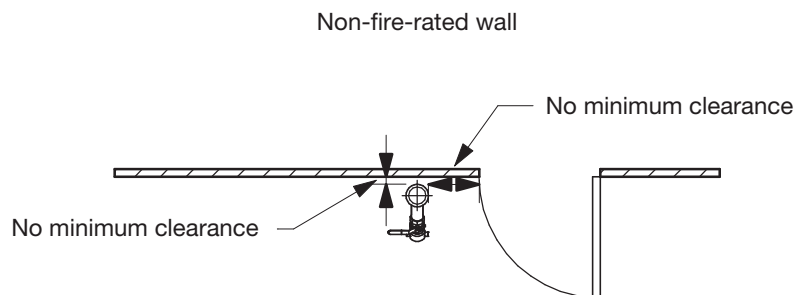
Sprinklered building – Hydrant outlet protection – No distance required – Plan view
